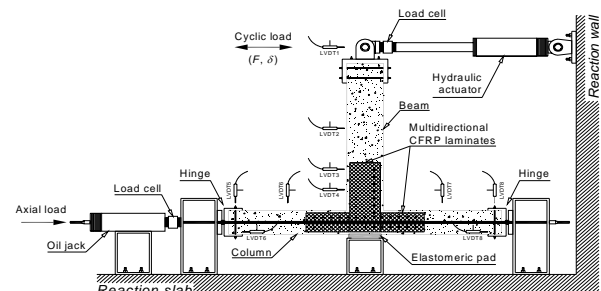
Test configuration used in the RC beam-column joints strengthened with multidirectional CFRP laminate tests.
